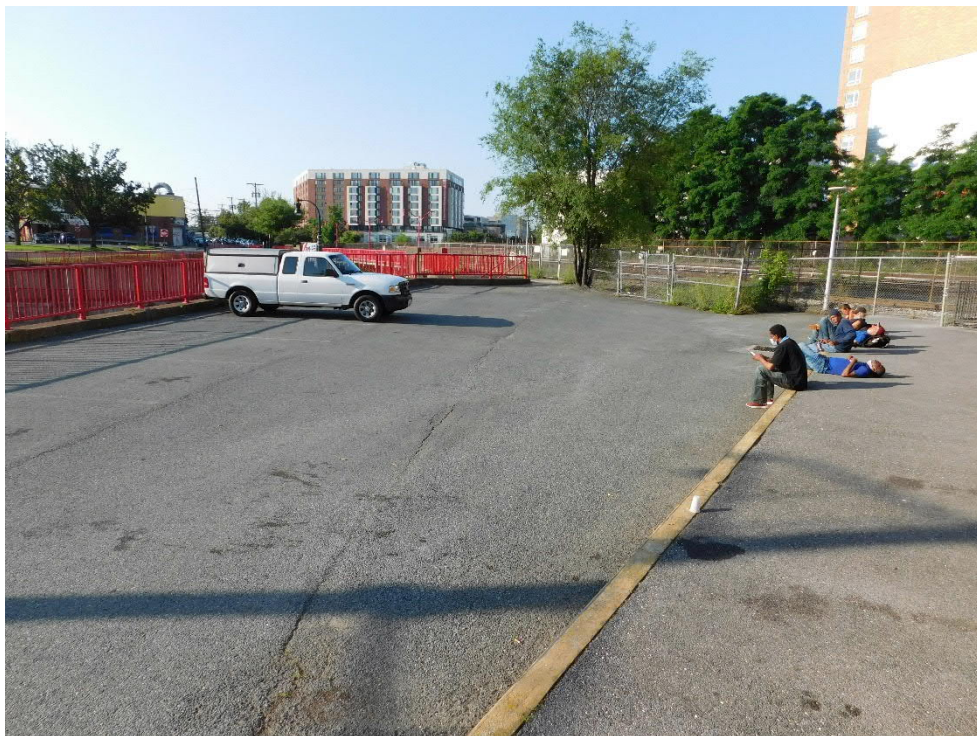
Existing Silver Spring B&O Railroad Station Parking Lot looking toward CSXT
